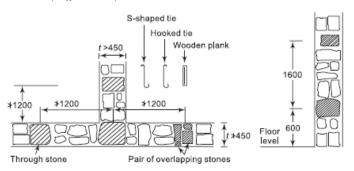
Through stone and bond elements (Source: ISET 1989)
